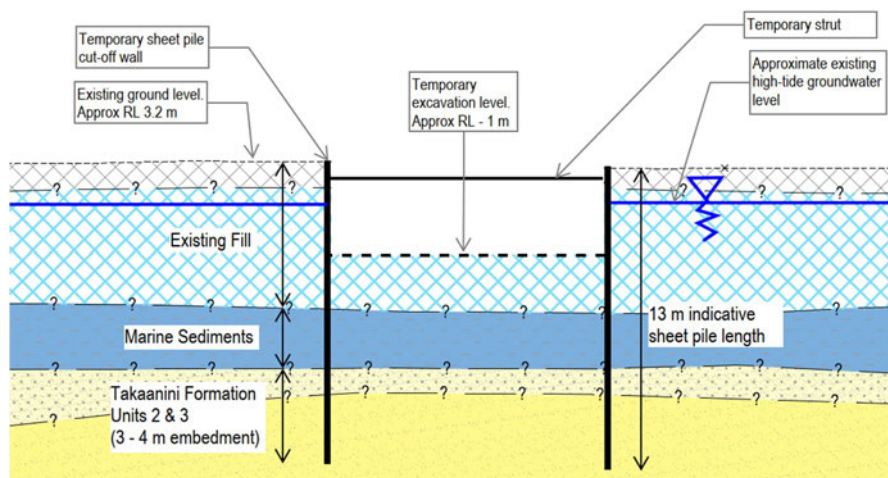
Concept Sketch – Sheet pile cutoff wall for core excavations
